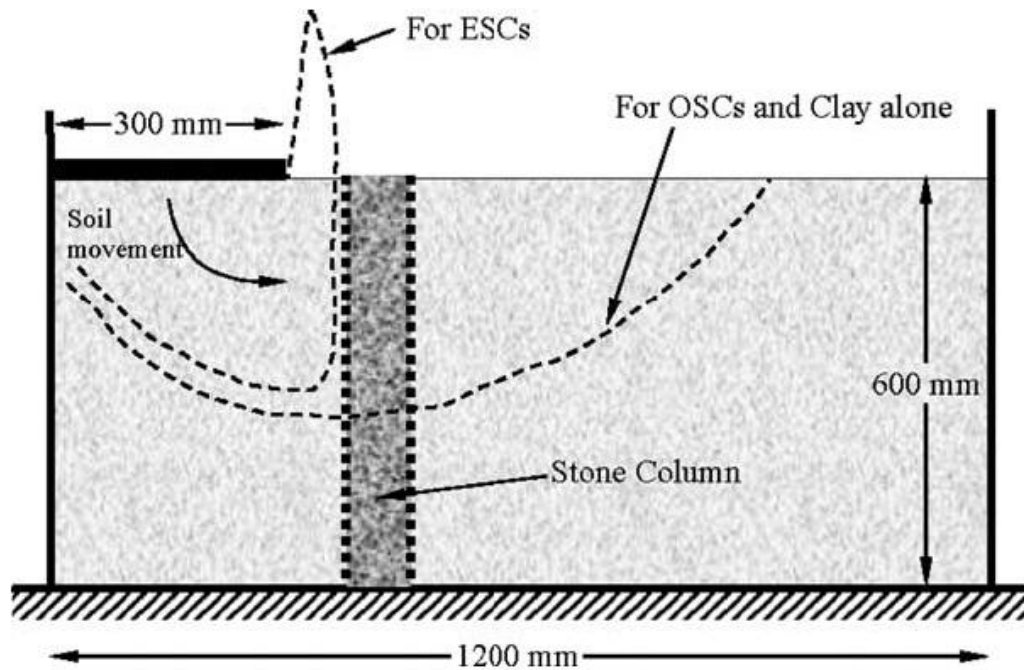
Failure surface observed in the clay, stone column and encased stone column reinforced clay (Murugesan and Rajagopal, 2009)
